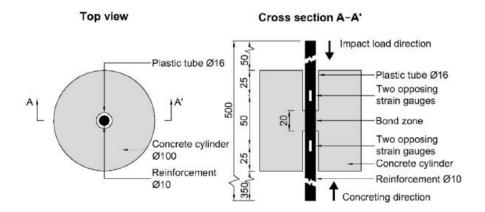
Pull-out test specimen (Maca, P et al. 2016)
